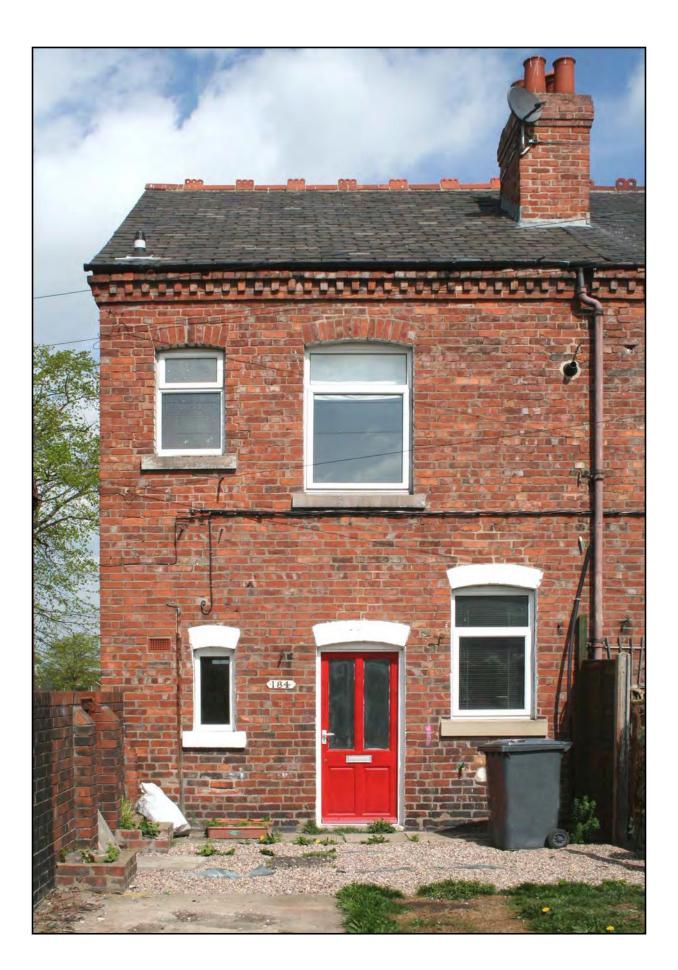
Rear view of one of the houses that faces the green at New Bolsover, showing windows lighting the kitchen and former pantry, and one lighting a bedroom with, alongside, an added window for a bathroom.
